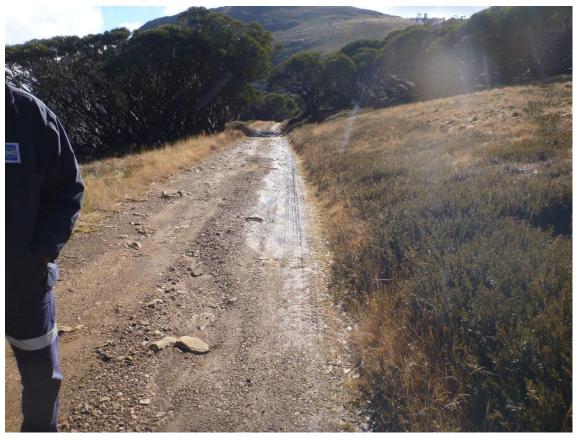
Groundwater Seepage at lowest point of proposed Koflers Stockpile area.
